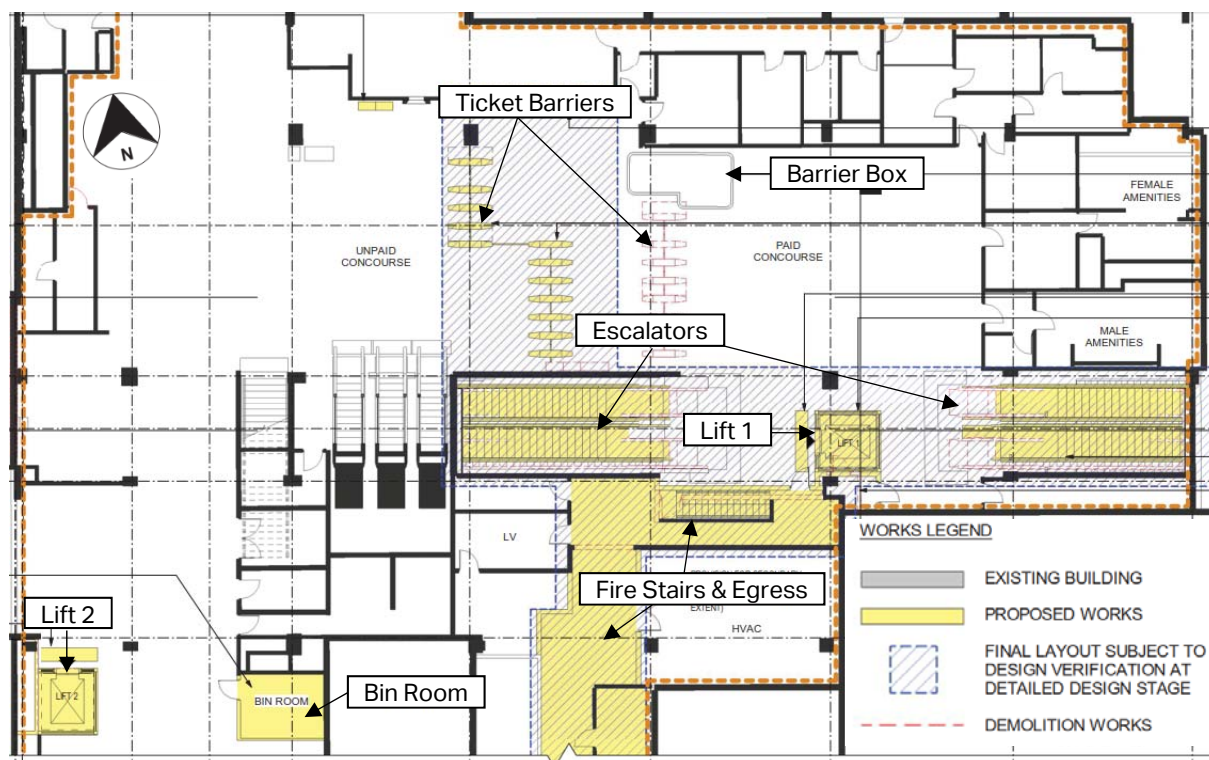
Plan of concourse indicating proposed location of lifts, escalators, stairs, bin room and gate line
